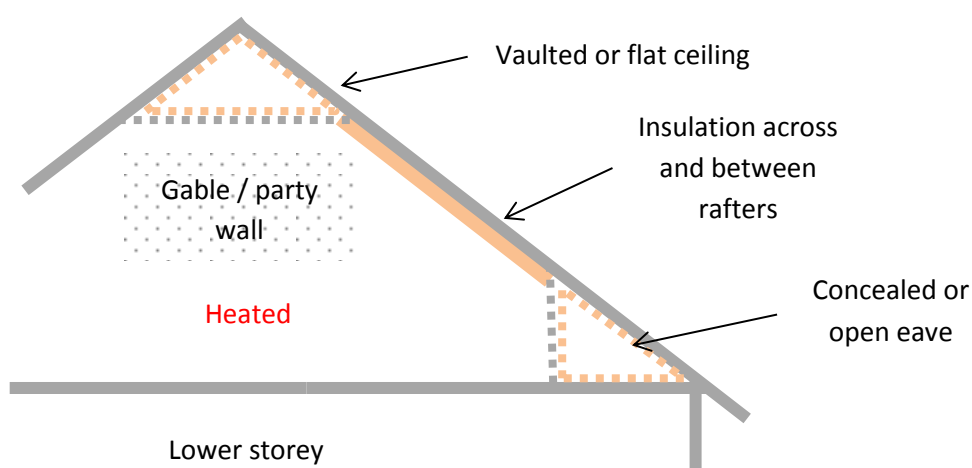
Cross-section showing basic elements of converted room-in-roof with rafter-level insulation
